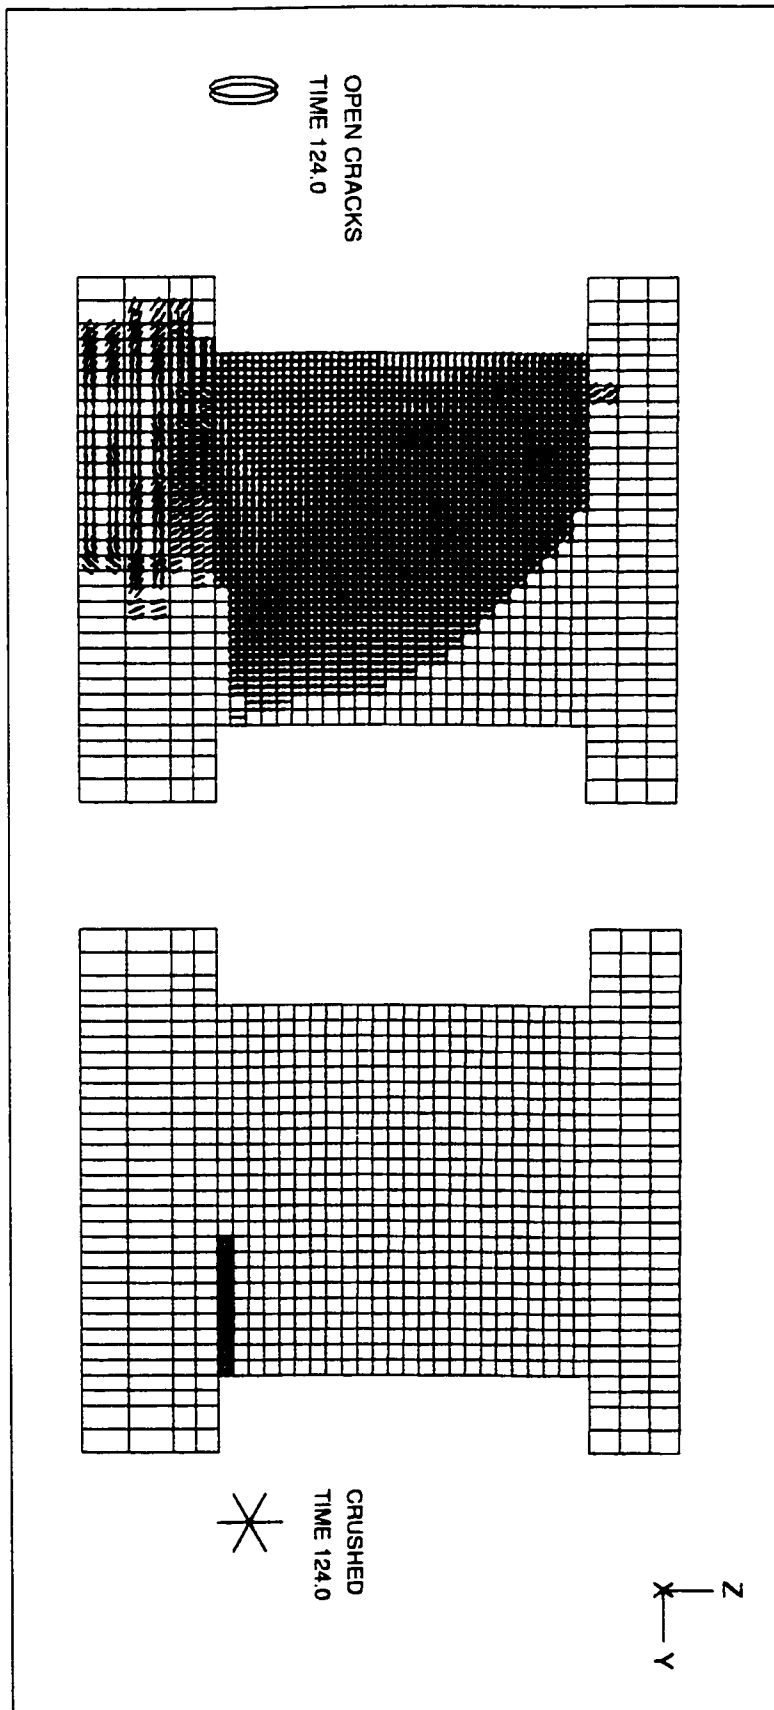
Cracking and crushing pattern of shear wall N4
